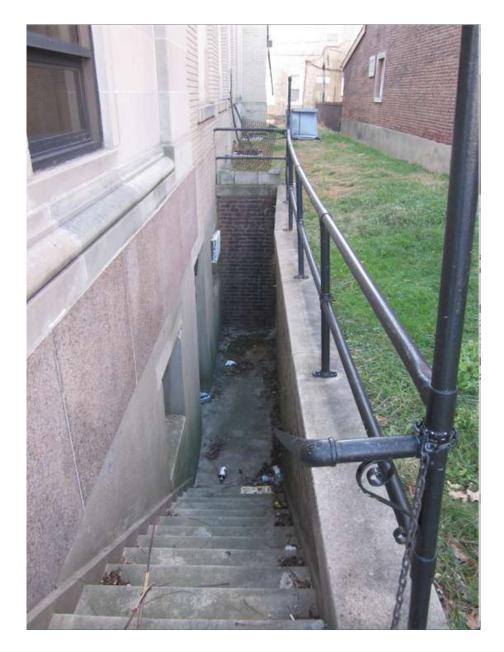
The excavated stairway cellar entrance on the North facade. Viewed from the Ridge Avenue sidewalk, 2016.
